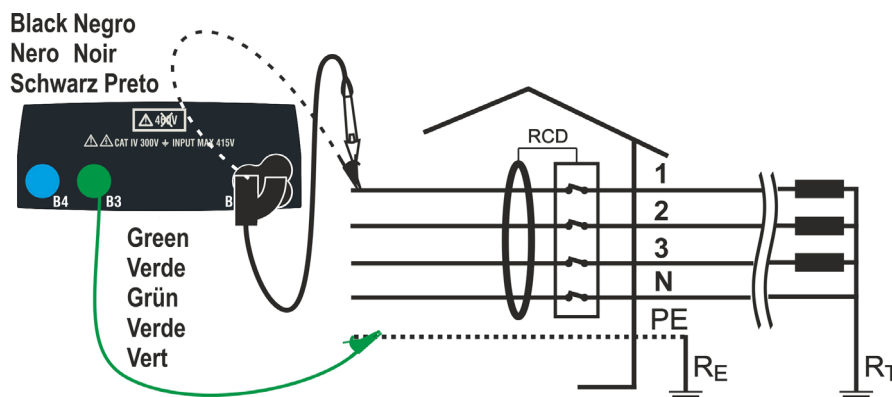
P-PE 2-wire test for three-phase with single cables and remote probe
